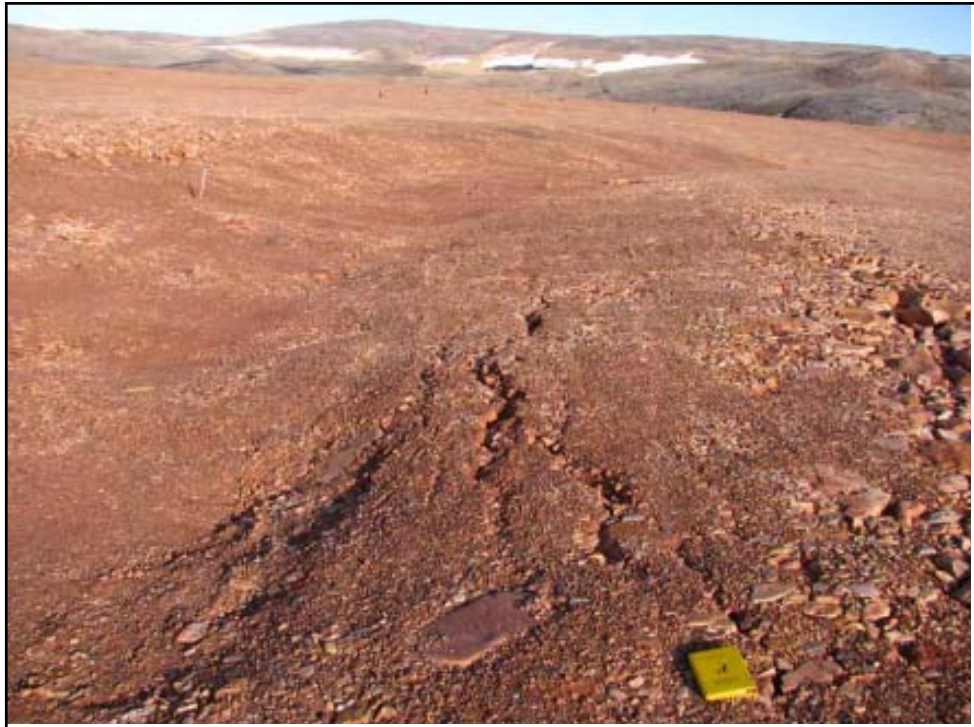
East/West drainage swale. Note minor cracking along edge of swale.
